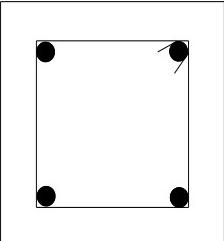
Reinforcement Detailing of the RetroFitted Specimens
